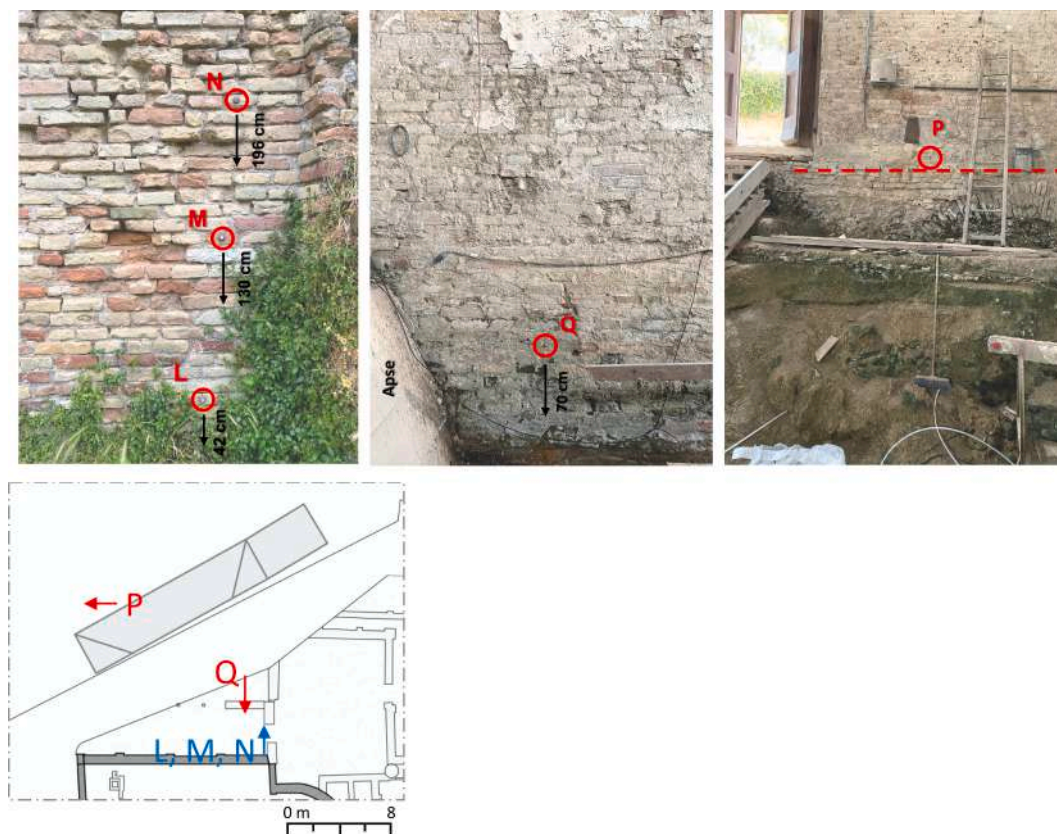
Above, from left to right: permanent sampling points L–M–N (south wall, exterior), Q (south wall, interior), P (west wall, interior; the dotted line indicates the road level). Below: location of the sampling holes in the church plan.
